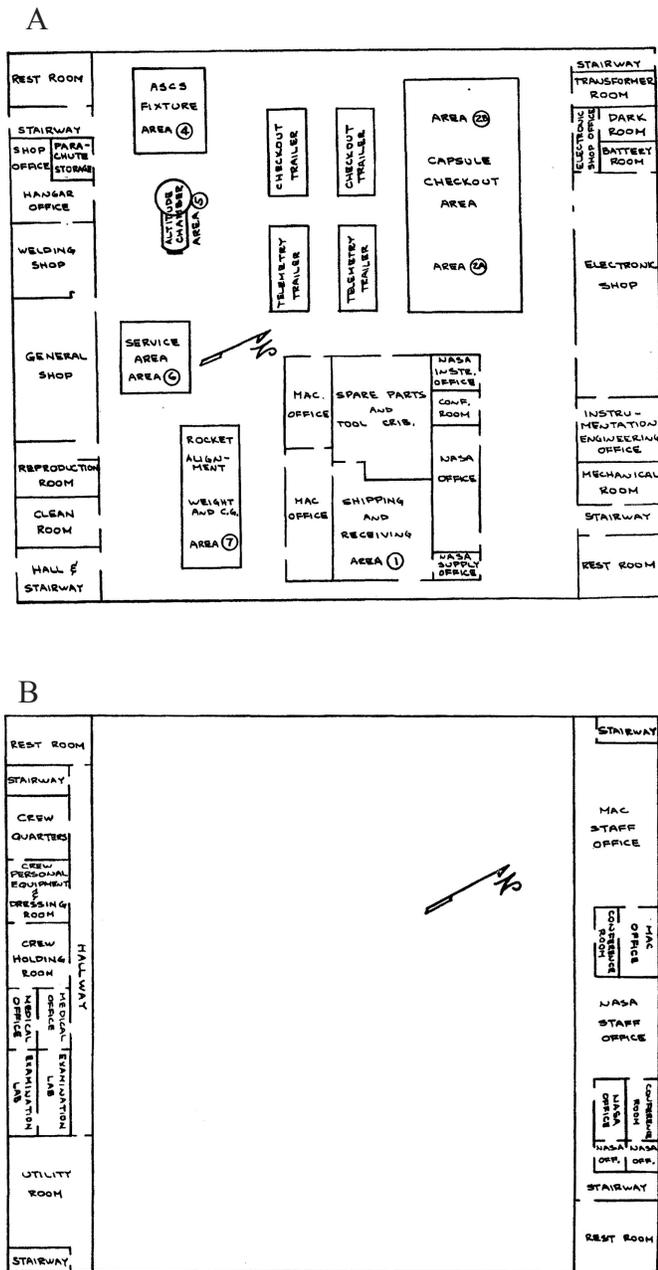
Hangar S, Layout and Floorplans During Mercury (Source: NASA 1960).
